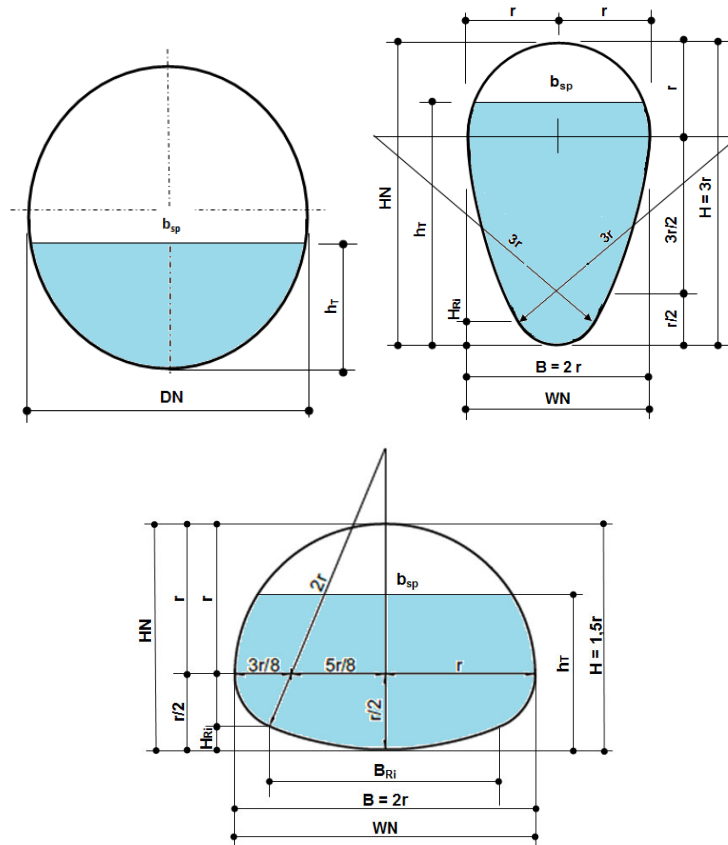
Typical sewer geometries: Round, egg shaped and taper-cross section sewer profile. Courtesy of the German professional association of concrete and reinforced concrete pipes (Fachvereinigung Betonrohre und Stahlbetonrohre e.V.). DN and WN represent the nominal diameter. HN is the sewer height whereas h_T represents the water level height. b_{sp} represents the water level width. H_{Ri} and B_{Ri} represent the hydraulic height and width, respectively and they are used for hydraulic calculations. r is the radius of the circular parts of the illustrated geometries.
